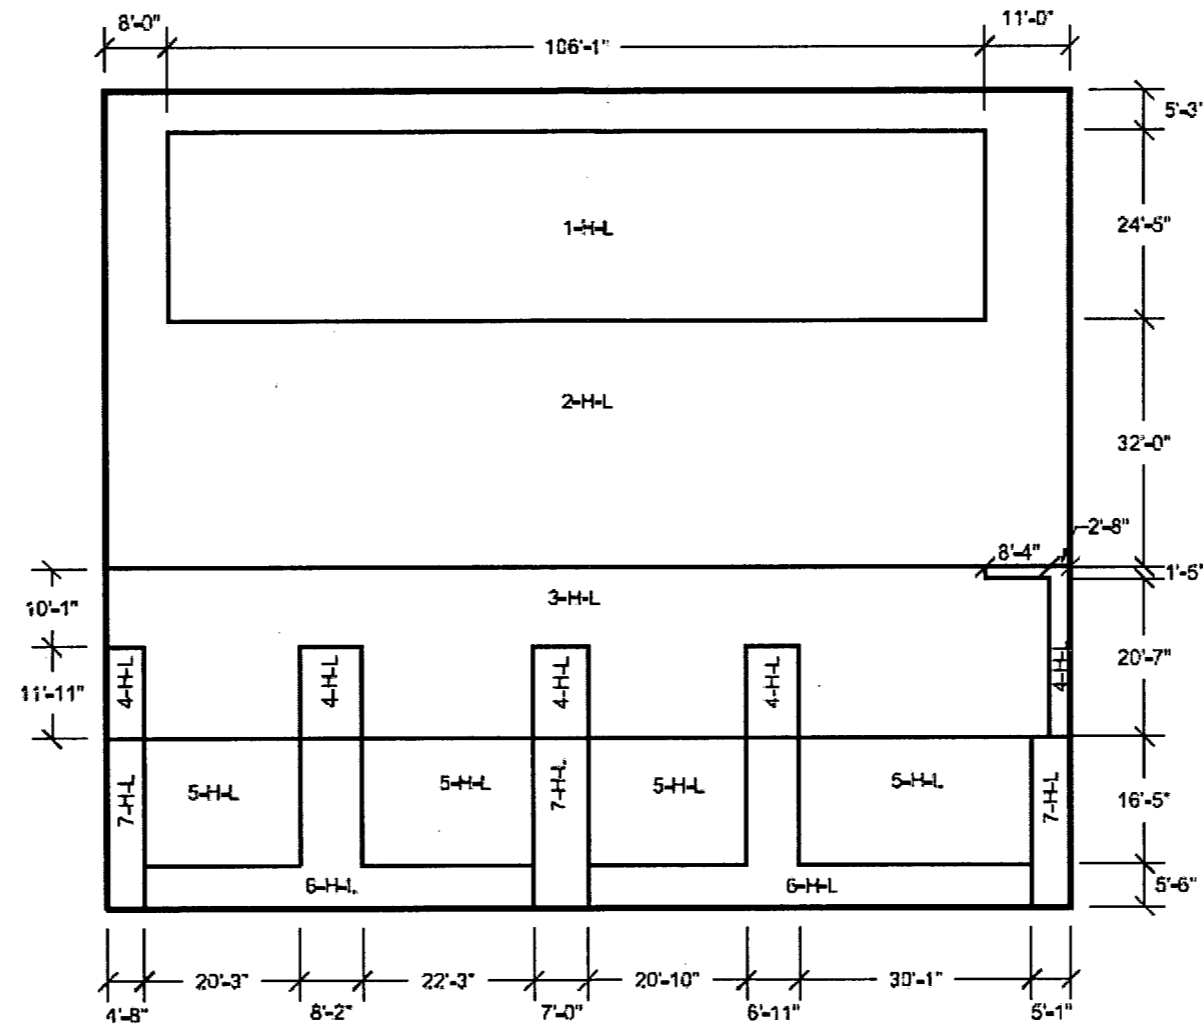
H.3-22: EAST WALL LOOKING WEST
